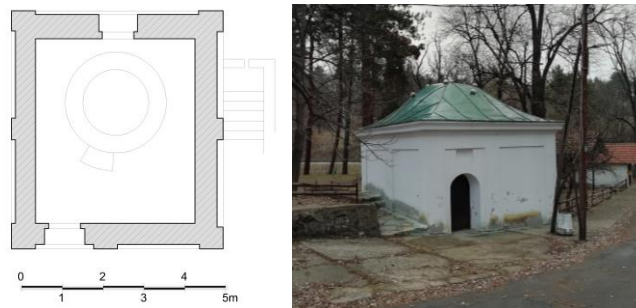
Floor plan (left) and photo (right) of Hammam in Brestovačka Banja drawing A.M.Petronijević according to [22], photo [9]
